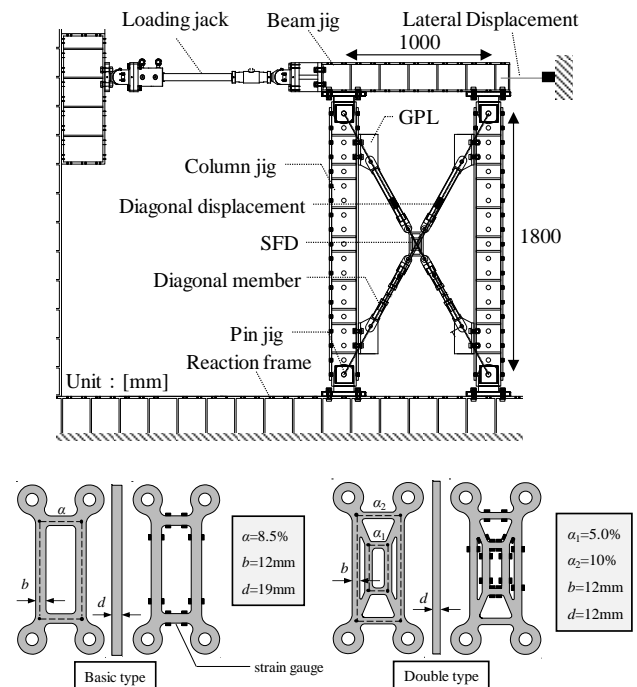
Elevation of test setup (unit: mm) and location of sensors
